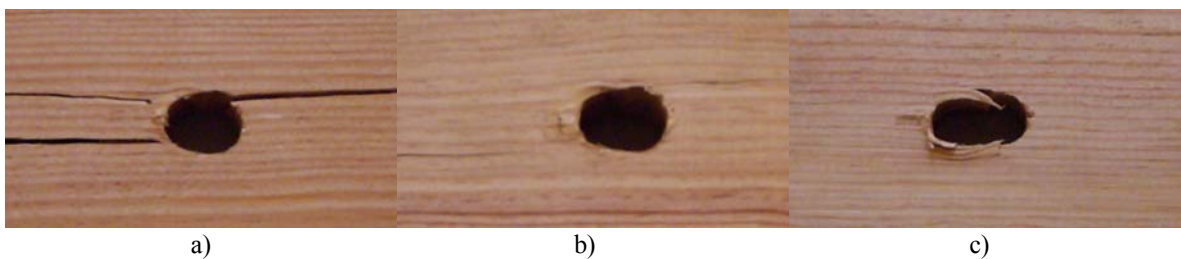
Typical failure modes of the center member of the joint: a) fragile failure – two shear cracks; b) fragile failure – single shear crack and c) ductile failure.
